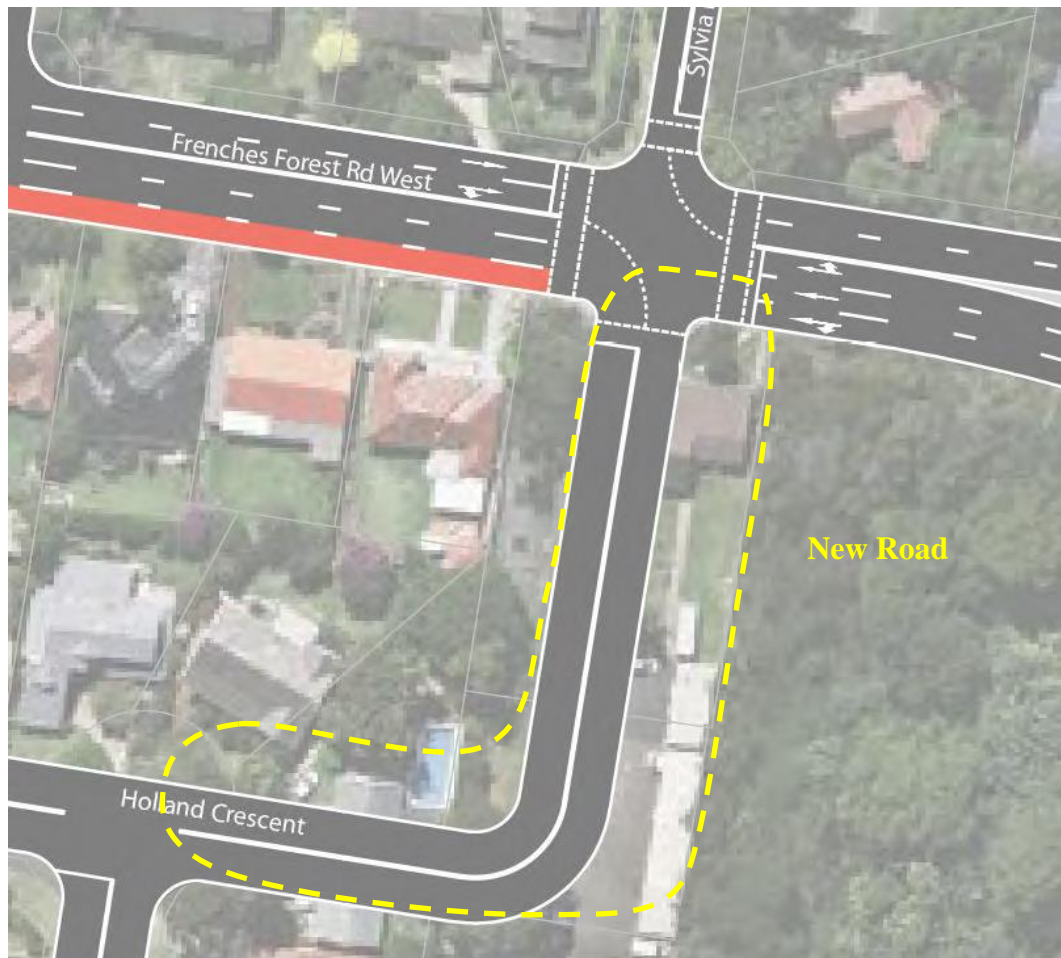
New Road from Holland Crescent to Frenchs Forest Road West
